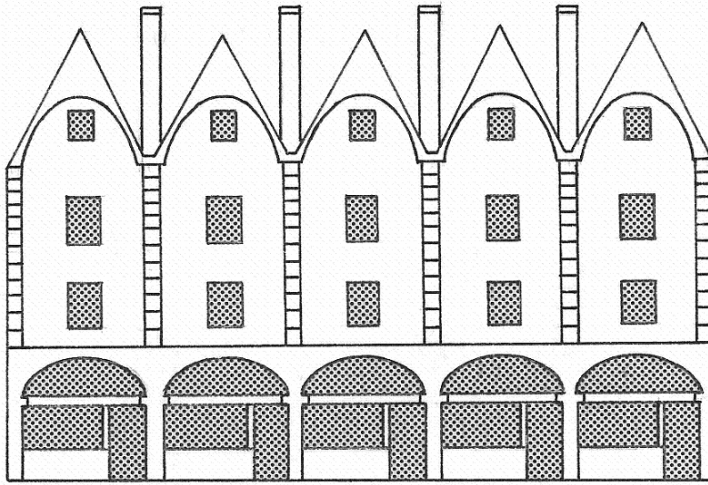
Pont Notre-Dame, Bridge Houses Plan, Reconstruction M. Mislin
